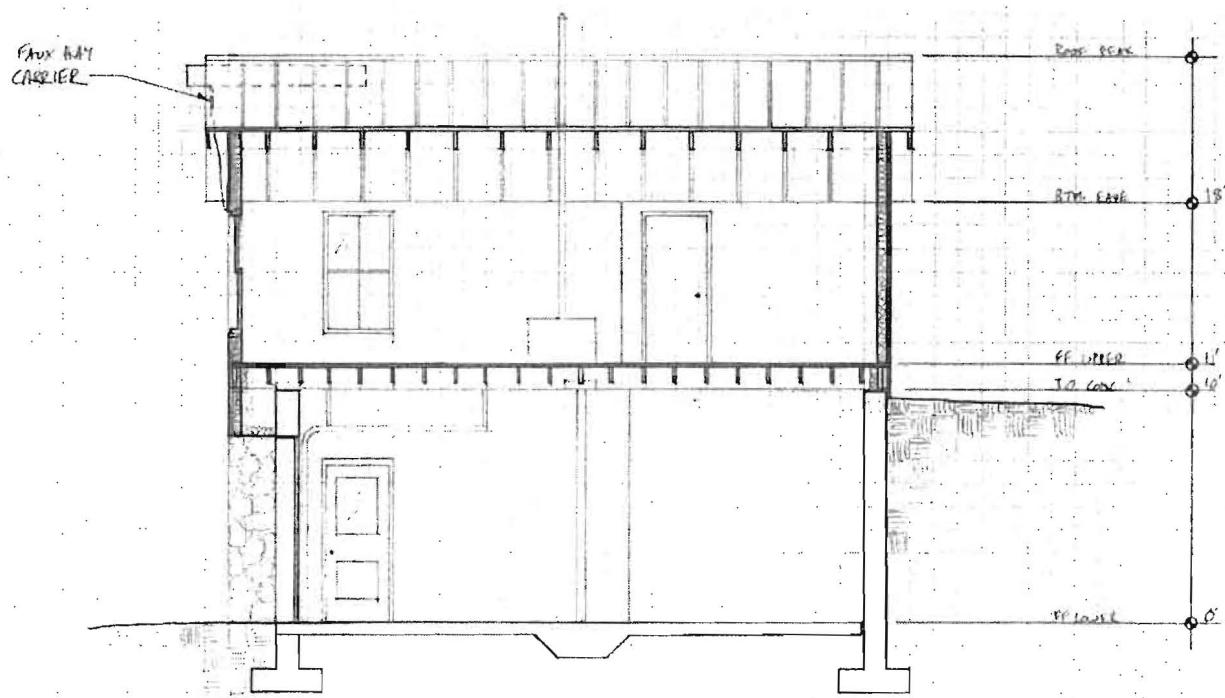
D.4 – East / West Building Section, facing South - Proposed Bank Barn / Accessory Structure
